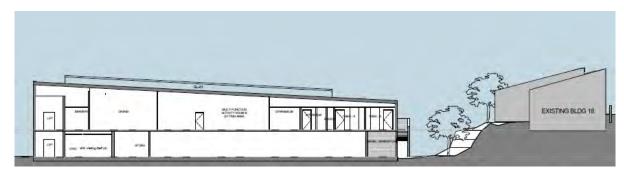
Section of the proposed development showing the proposed building's relationship to the existing rock face and the neighbouring Building 18
